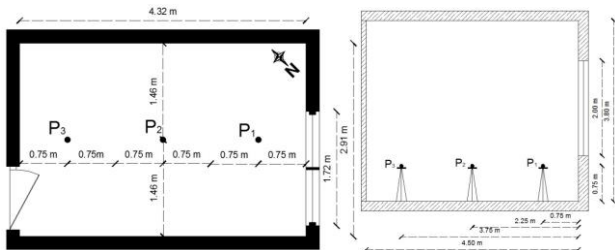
Geometry of the test room for the field measurement: (left) plan; (right) section
